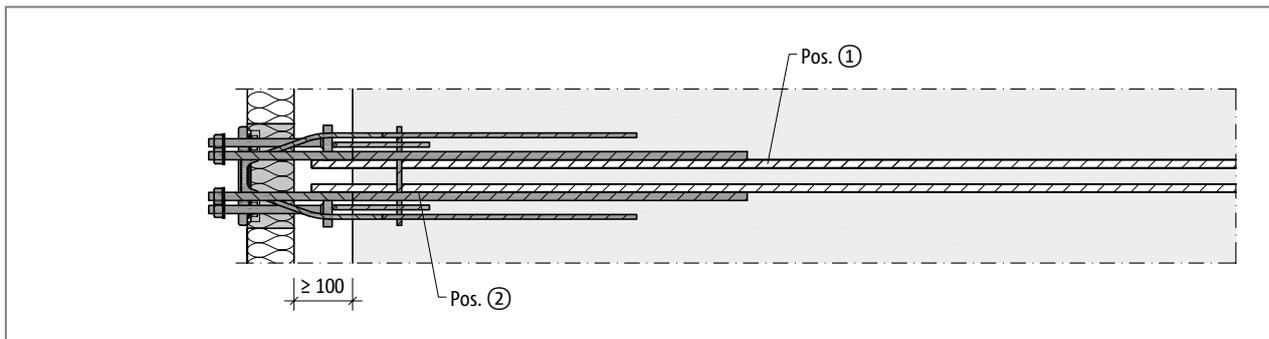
Schöck Isokorb® T type SK-M1: On-site reinforcement for semi-precast construction: Plan view
